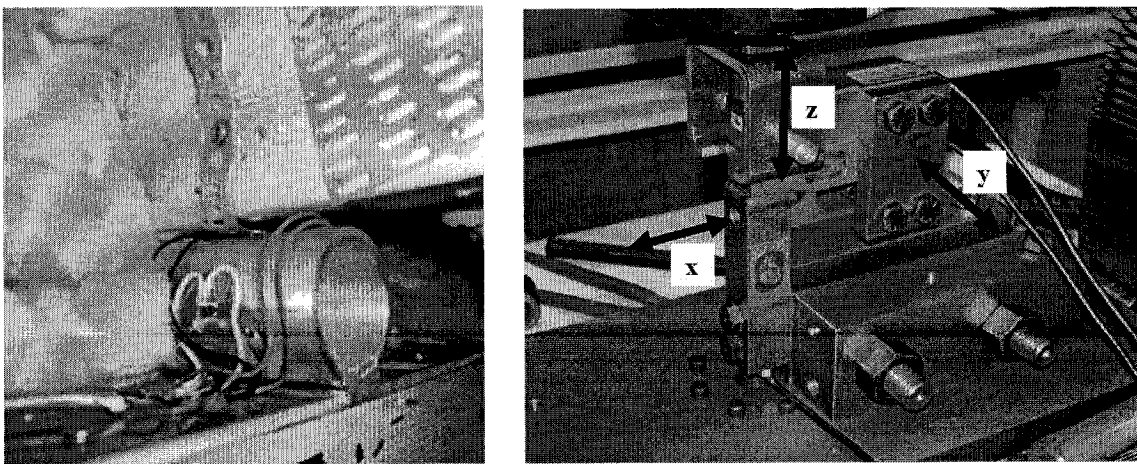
Roof and foundation load cell details (after Doudak 2005)
